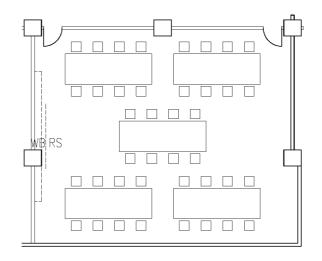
Dedicated Networking Teaching Laboratory Floor Plan
